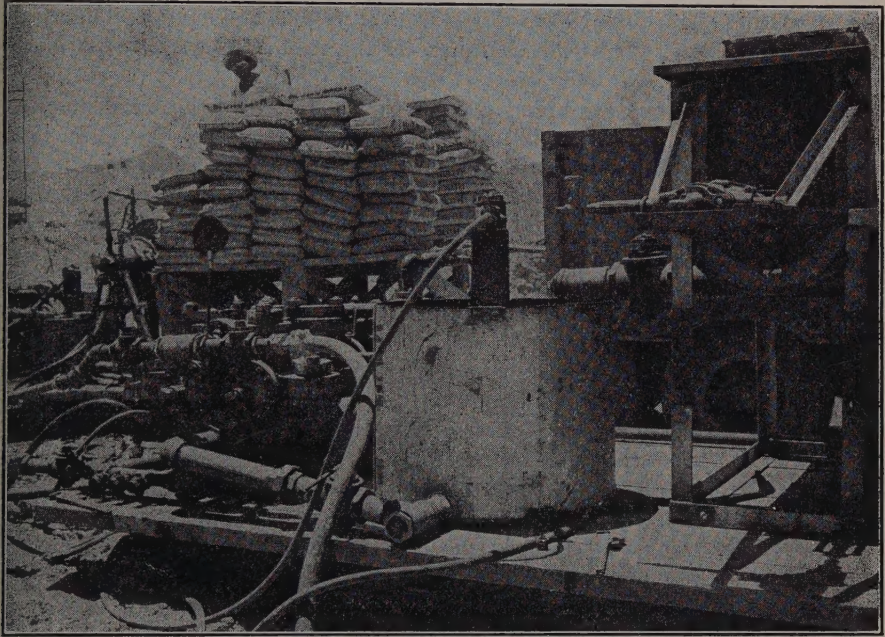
CONTRACTOR'S GROUT PLANT AT DAVIS DAM ON THE COLORADO RIVER
